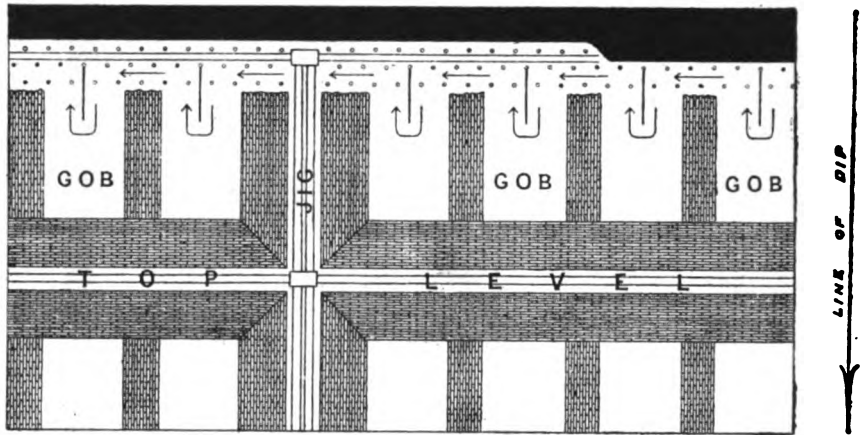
FLORENCE COLLIERY, LONGTON, NORTH STAFFORDSHIRE. PLAN OF LONGWALL FACE WITH THE GATE-ROAD AND PACKWALLS CONNECTED WITH IT, IN THE GREAT ROW COAL.
